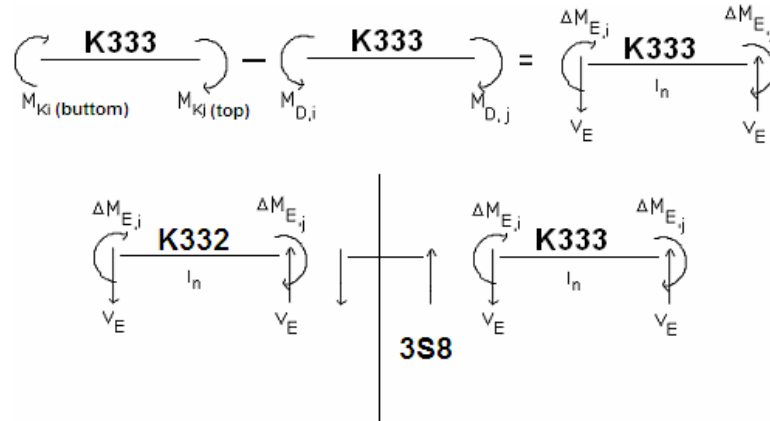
Shear force transmitted from K332 and K333 to column 3S8
